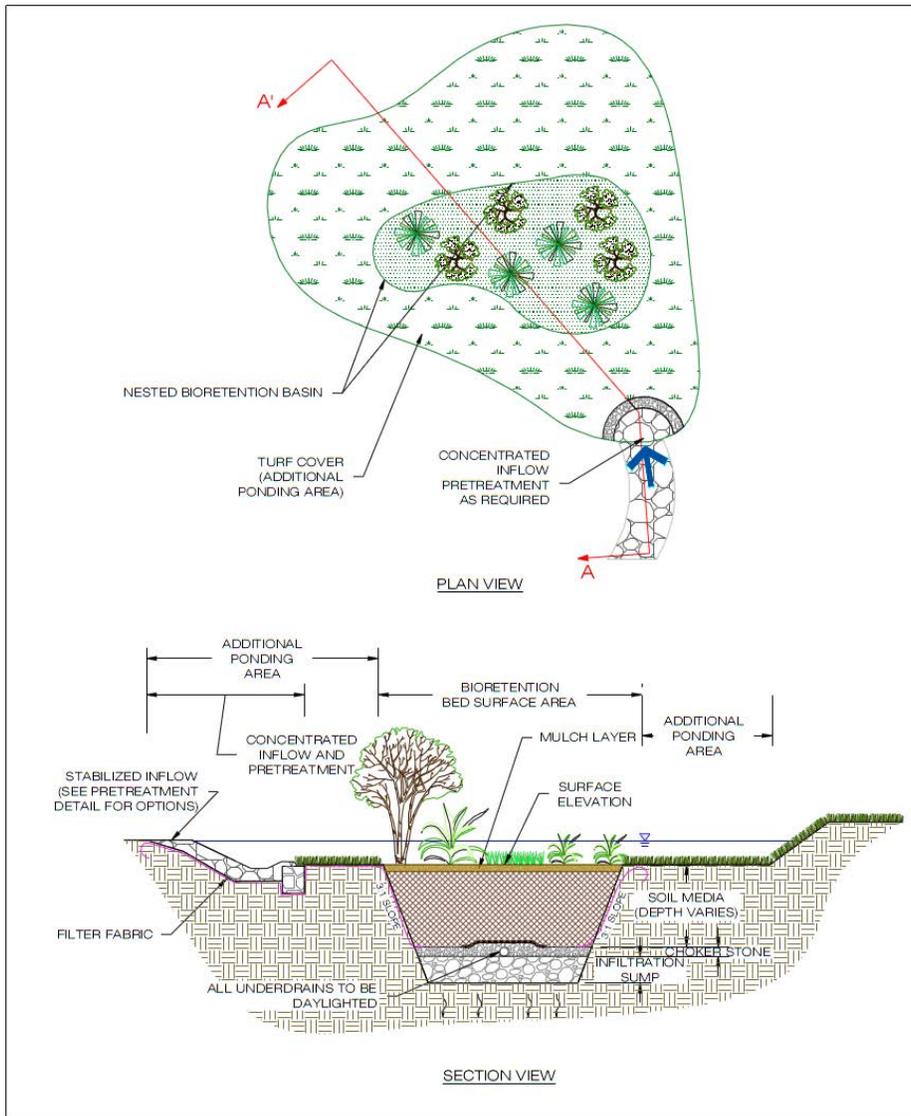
Typical Detail of Bioretention with Additional Surface Ponding
